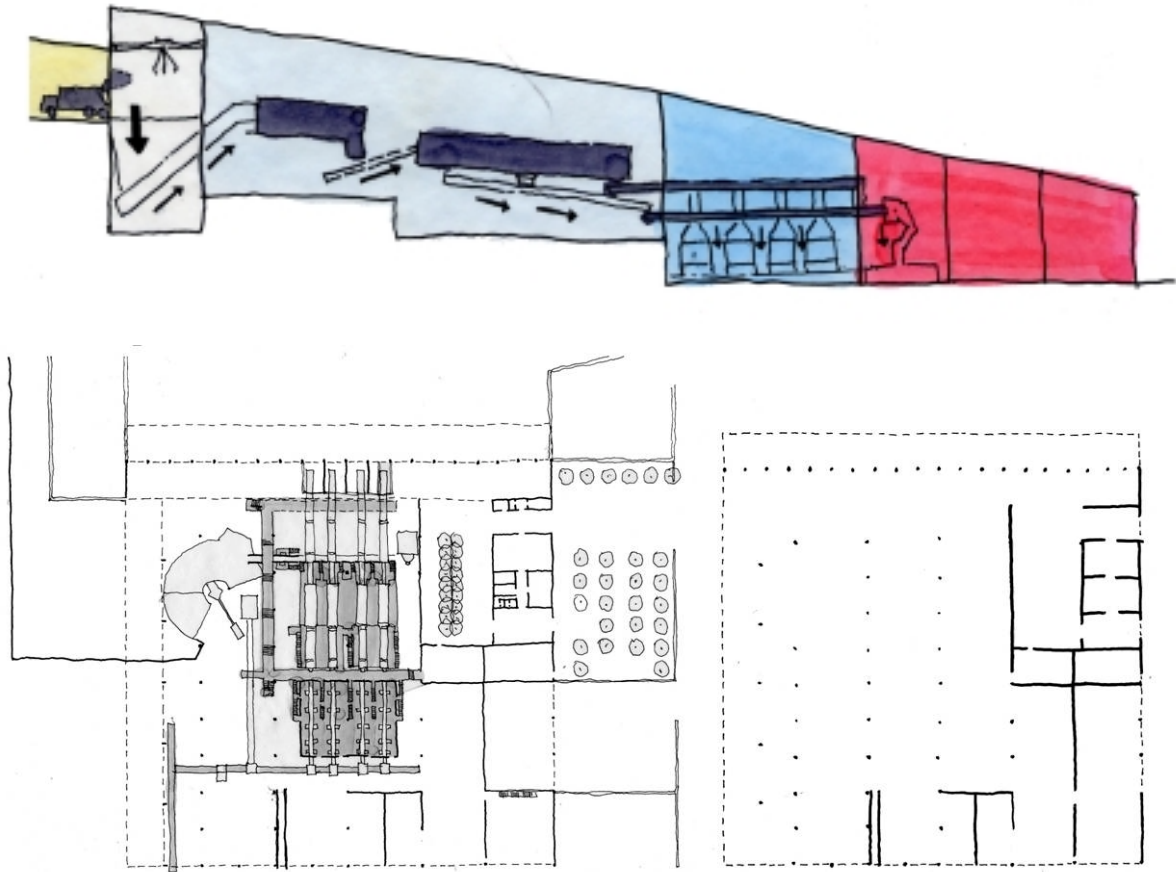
Waste processing machine plan and structural plan of Madrid Recycling Plant
